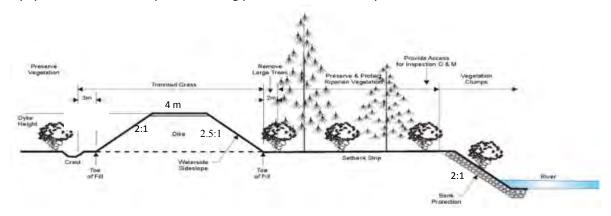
Typical setback dike cross section (Dike Design and Construction Guide, Best Management Practices for British Columbia 2003)
